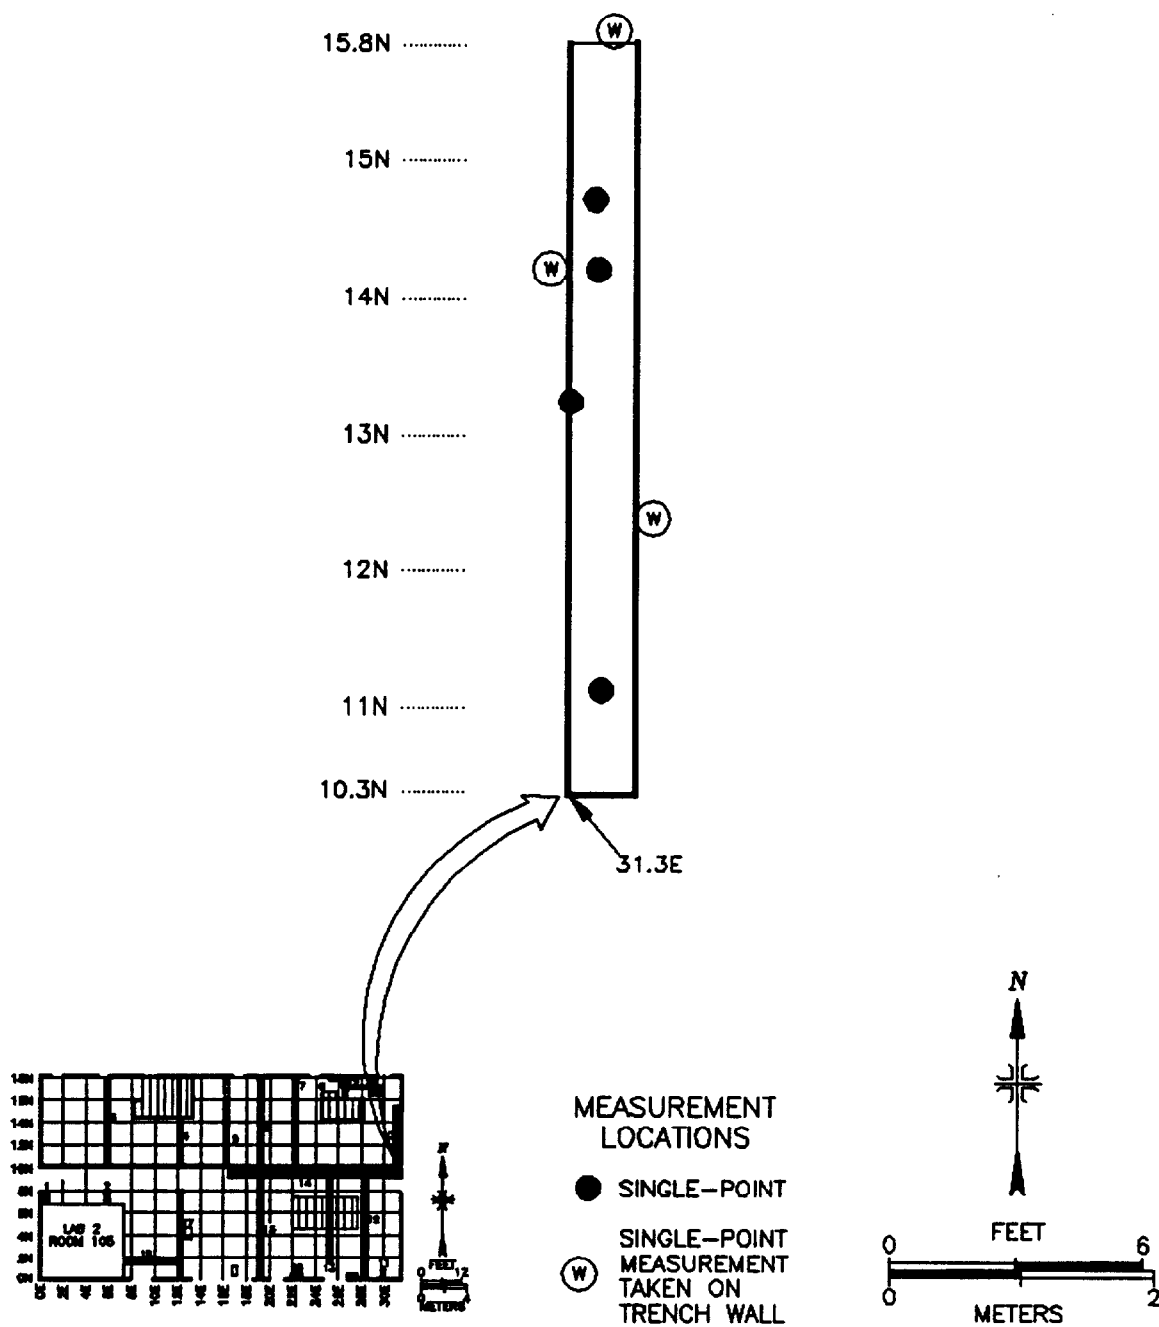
Building 23, Lab 1, Trench #10 – Measurement Locations
